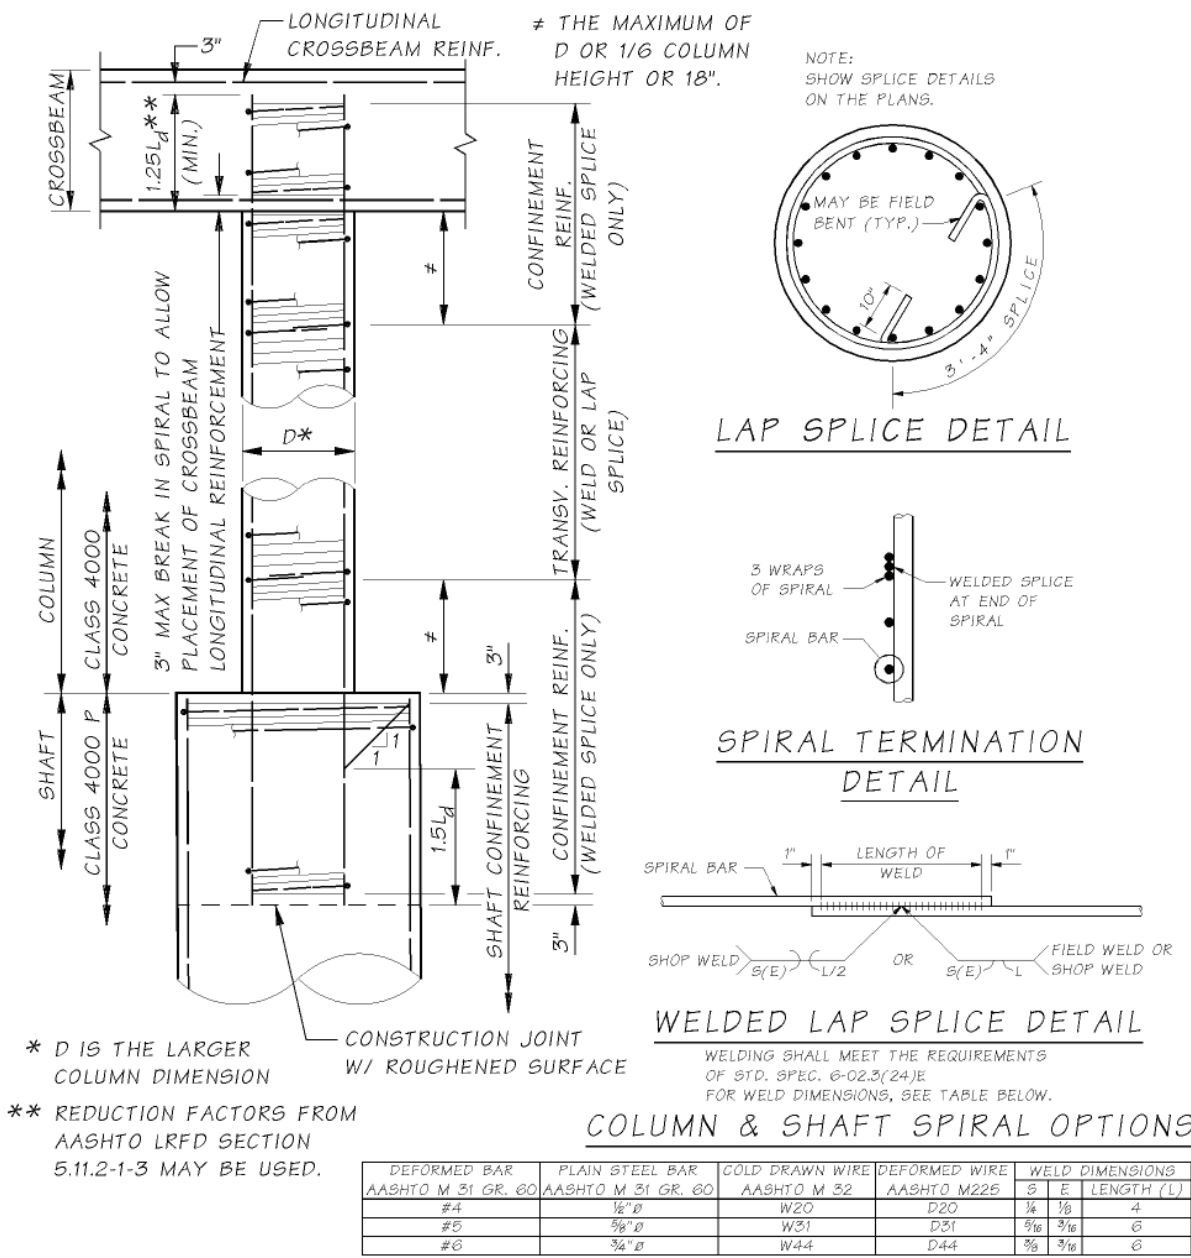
Washington DOT Type II Connection Detail (from WashDOT Substructure Design Manual, 2006)
